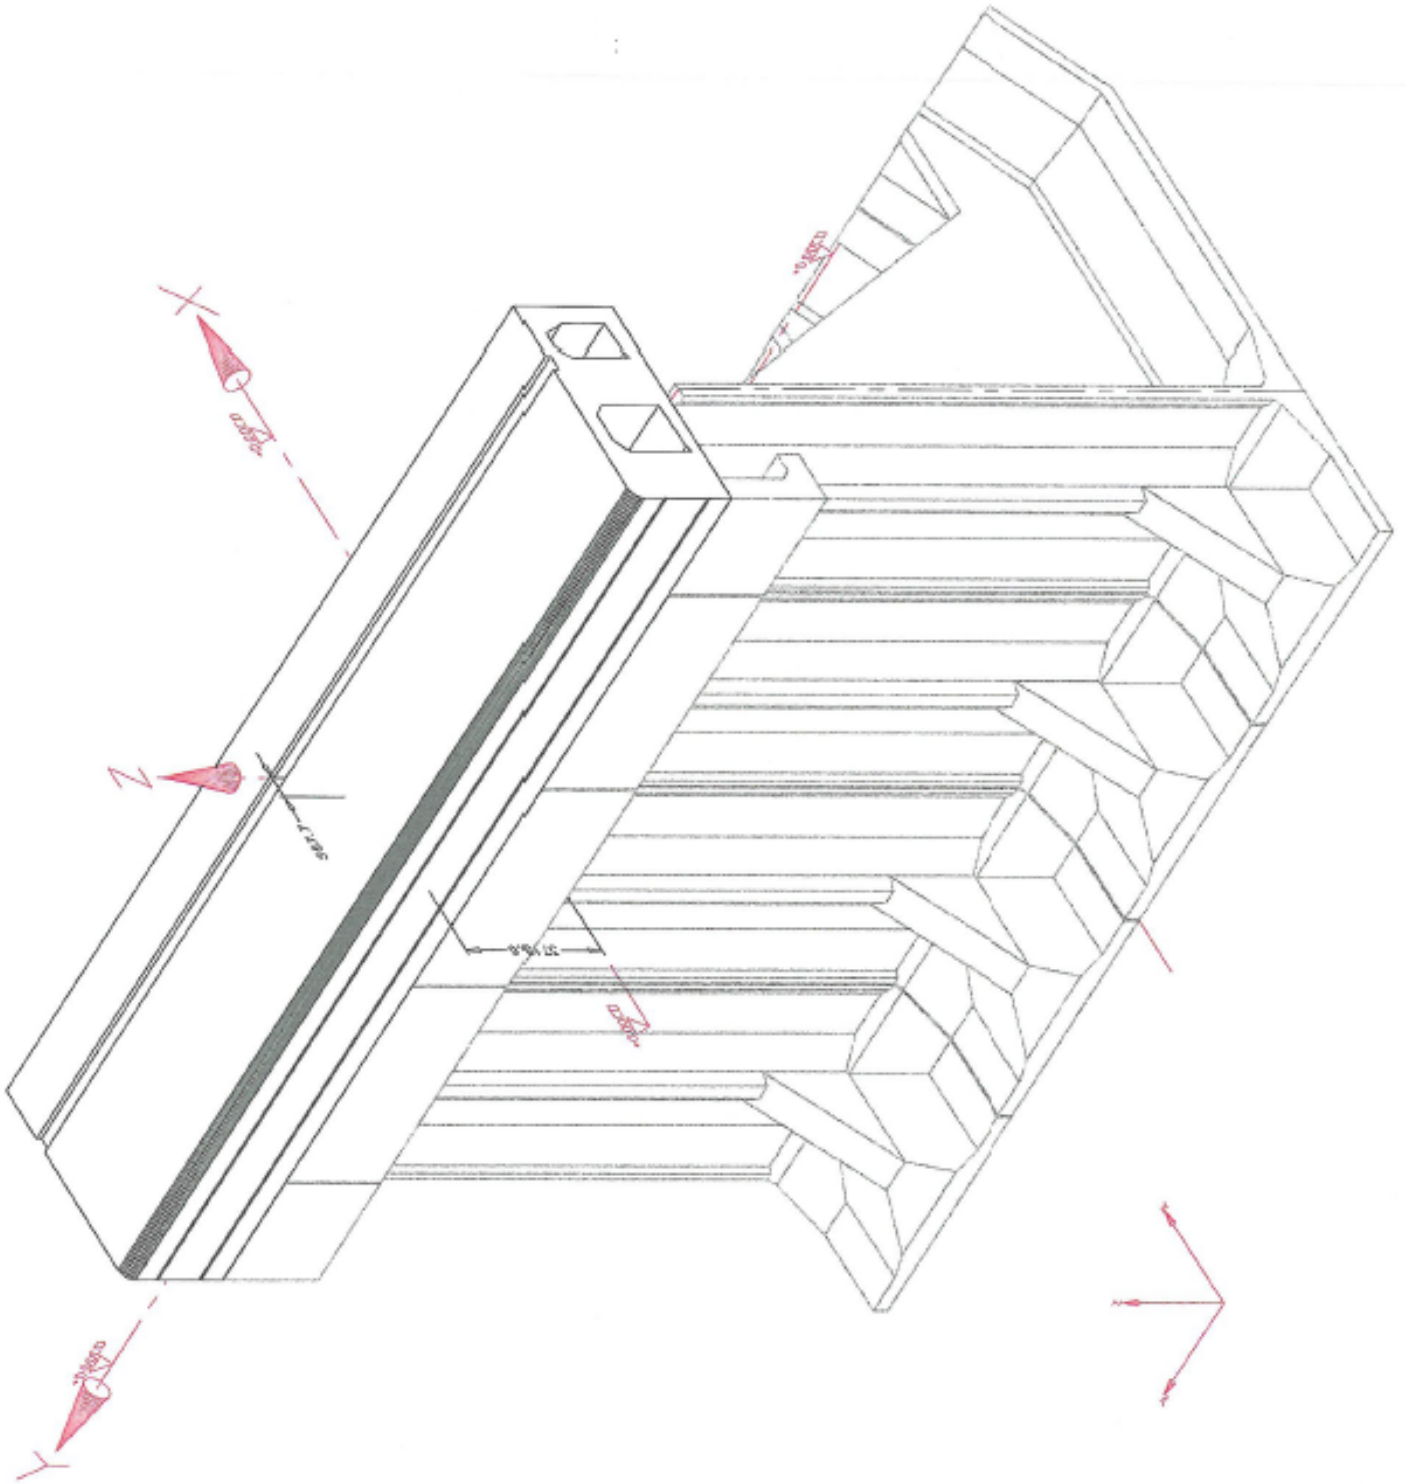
As Built set of 4 precast units with proposed capping beam
